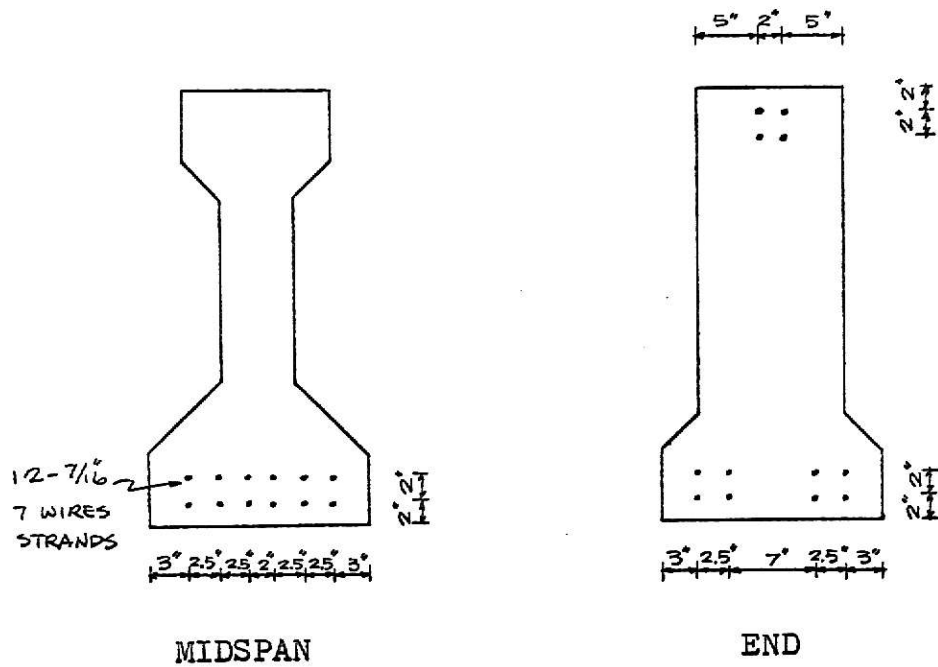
ARRANGEMENT OF RPESTRESSING STEEL OF SPAN AB
